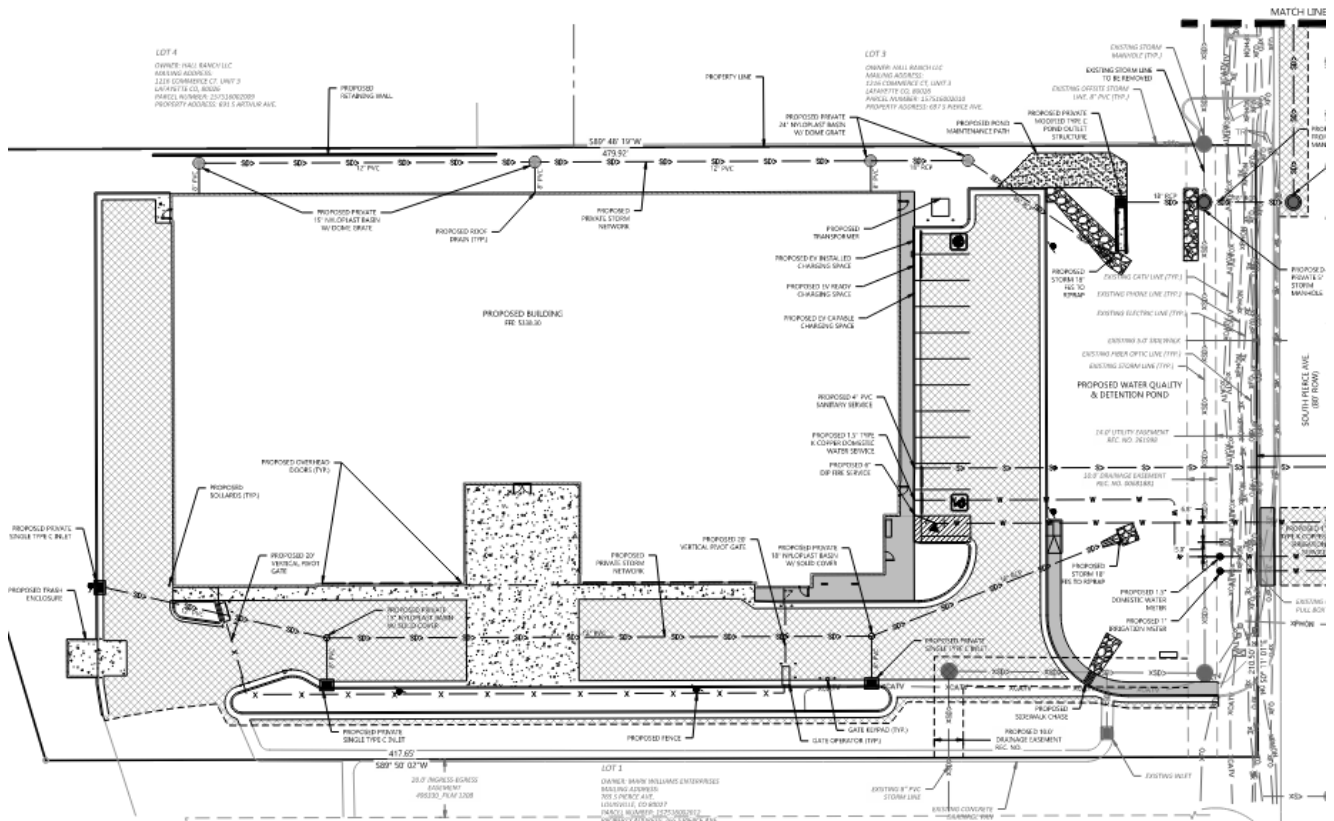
Overall layout of structure, parking, drive aisles, detention pond, walkways
